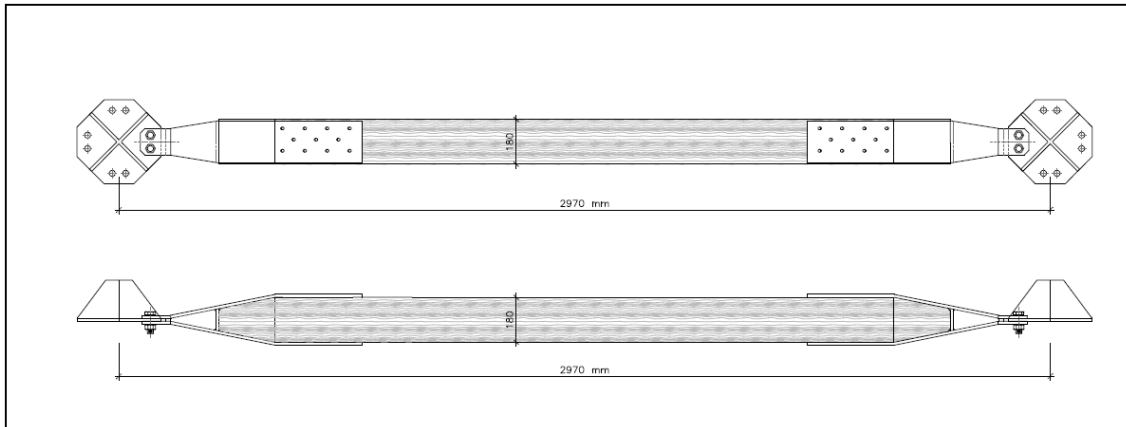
Glued laminated timber truss with OCTATUBE connectors.
